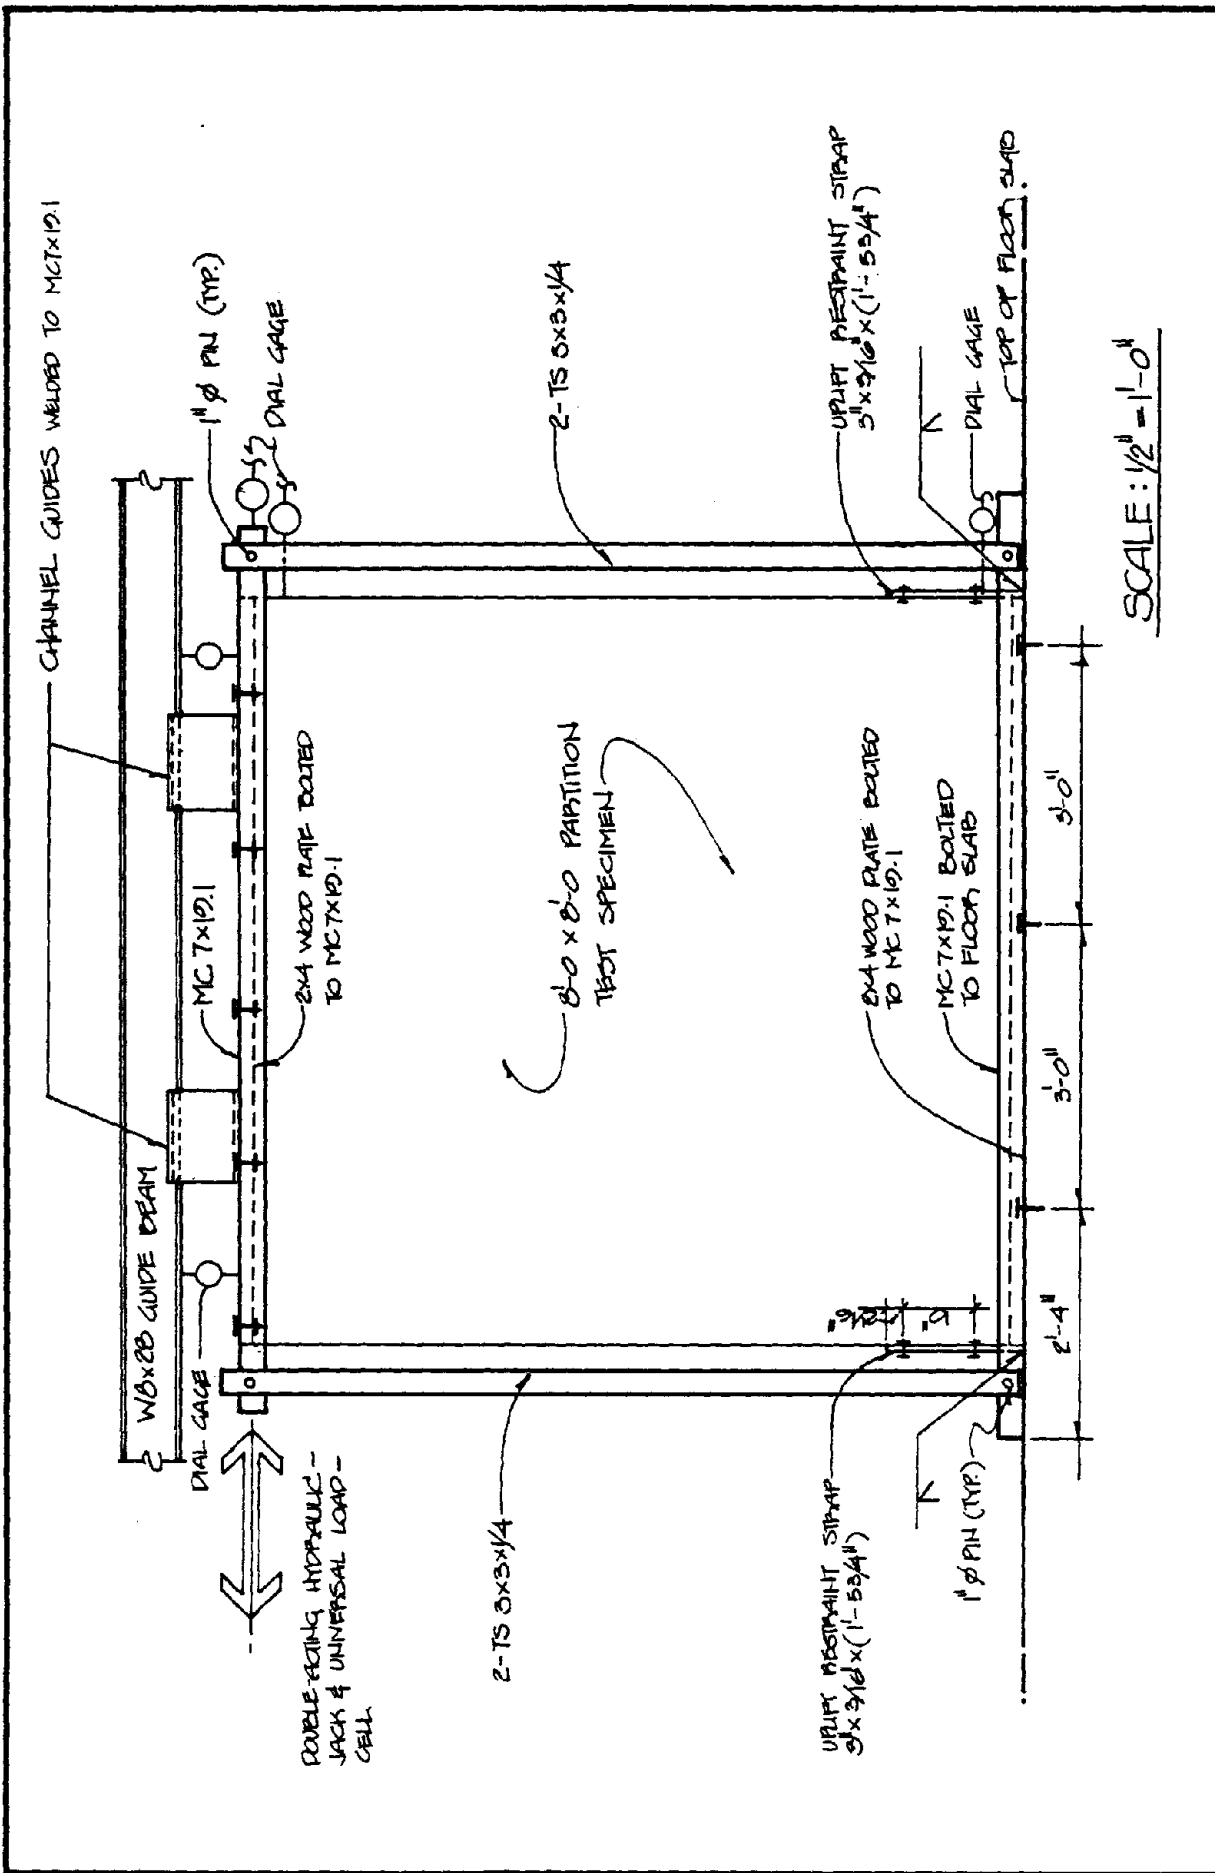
RACKING TESTS OF PARTITIONS: DETAILS OF TEST SET-UP
